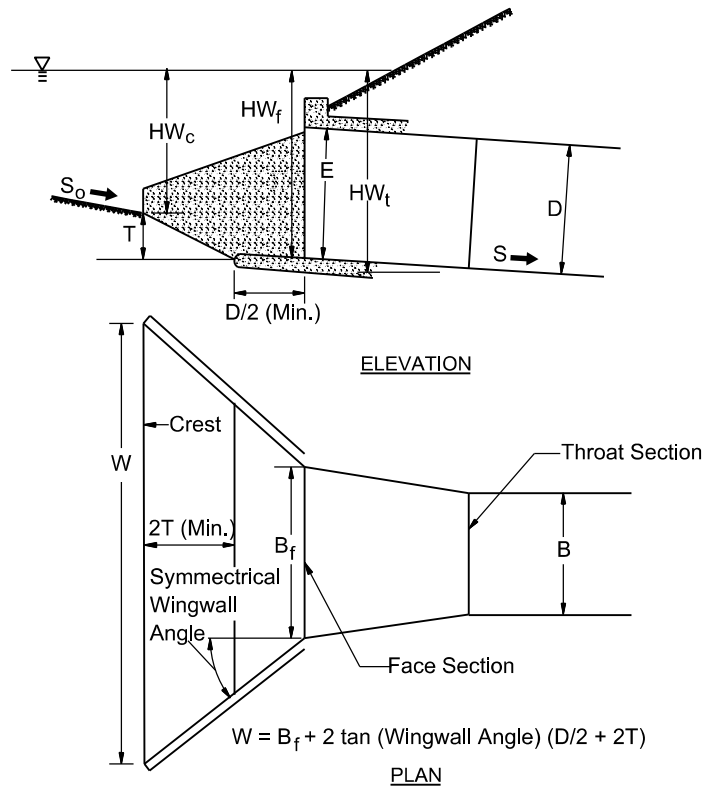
B — SIDE-TAPERED INLET WITH UPSTREAM DEPRESSION CONTAINED BETWEEN WINGWALLS
